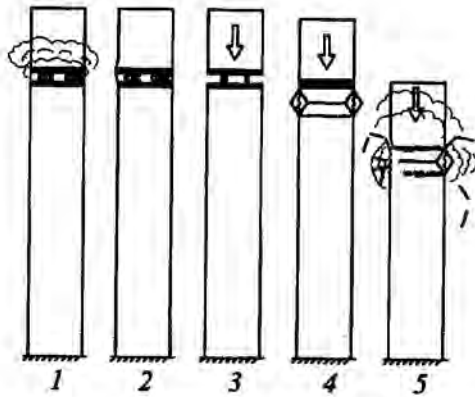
Stages of collapse of the building (floor height exaggerated)
